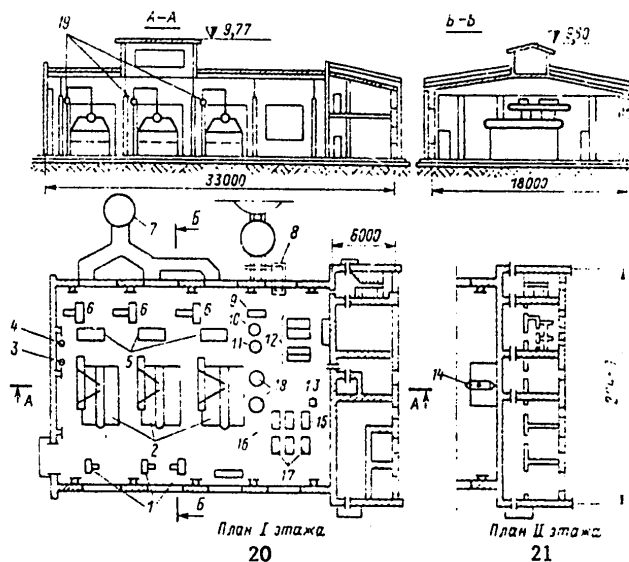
Layout drawings of a standard block boiler plant with DKVR-type boilers
